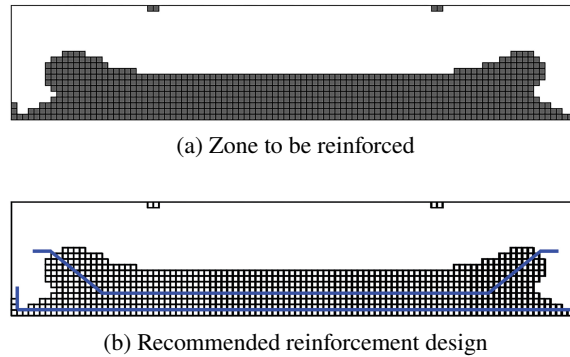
Optimal layout of reinforcing bars of example 1 ($RR = 40\%$)
